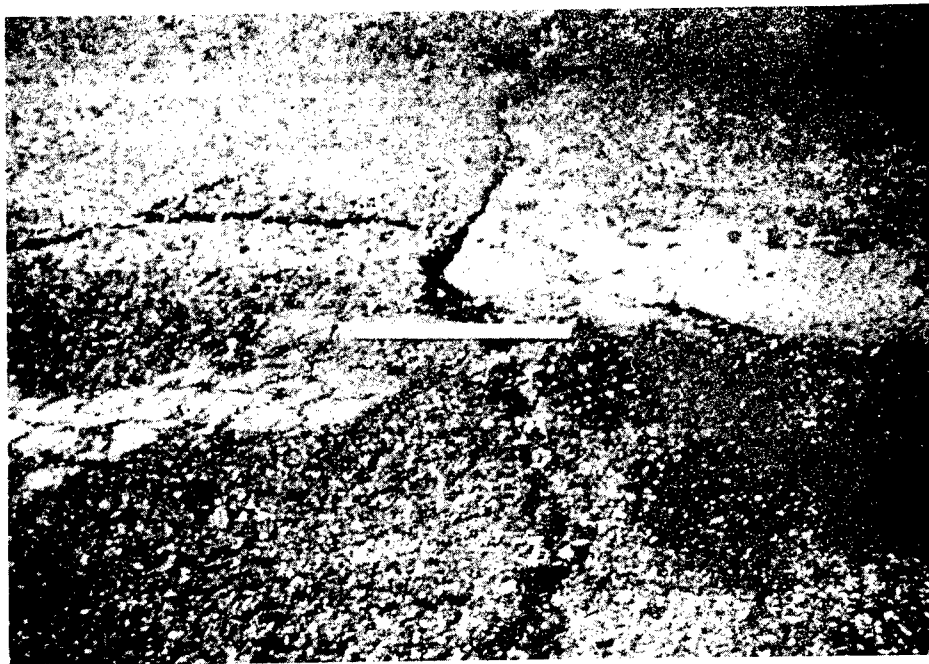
High severity longitudinal crack, flexible pavement
